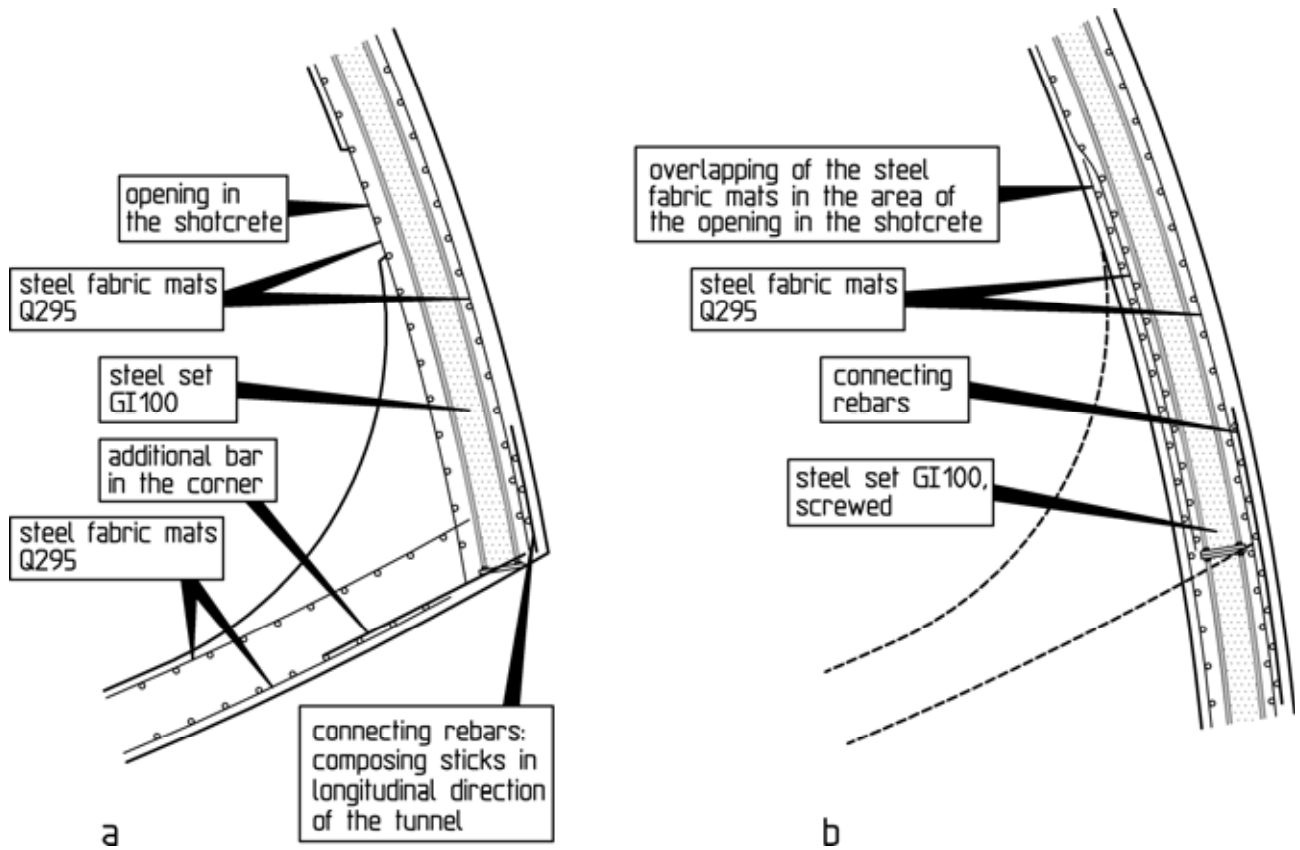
Design of support in the area of the crown's foot: a) Crown excavation; b) excavation of the bench and the invert
